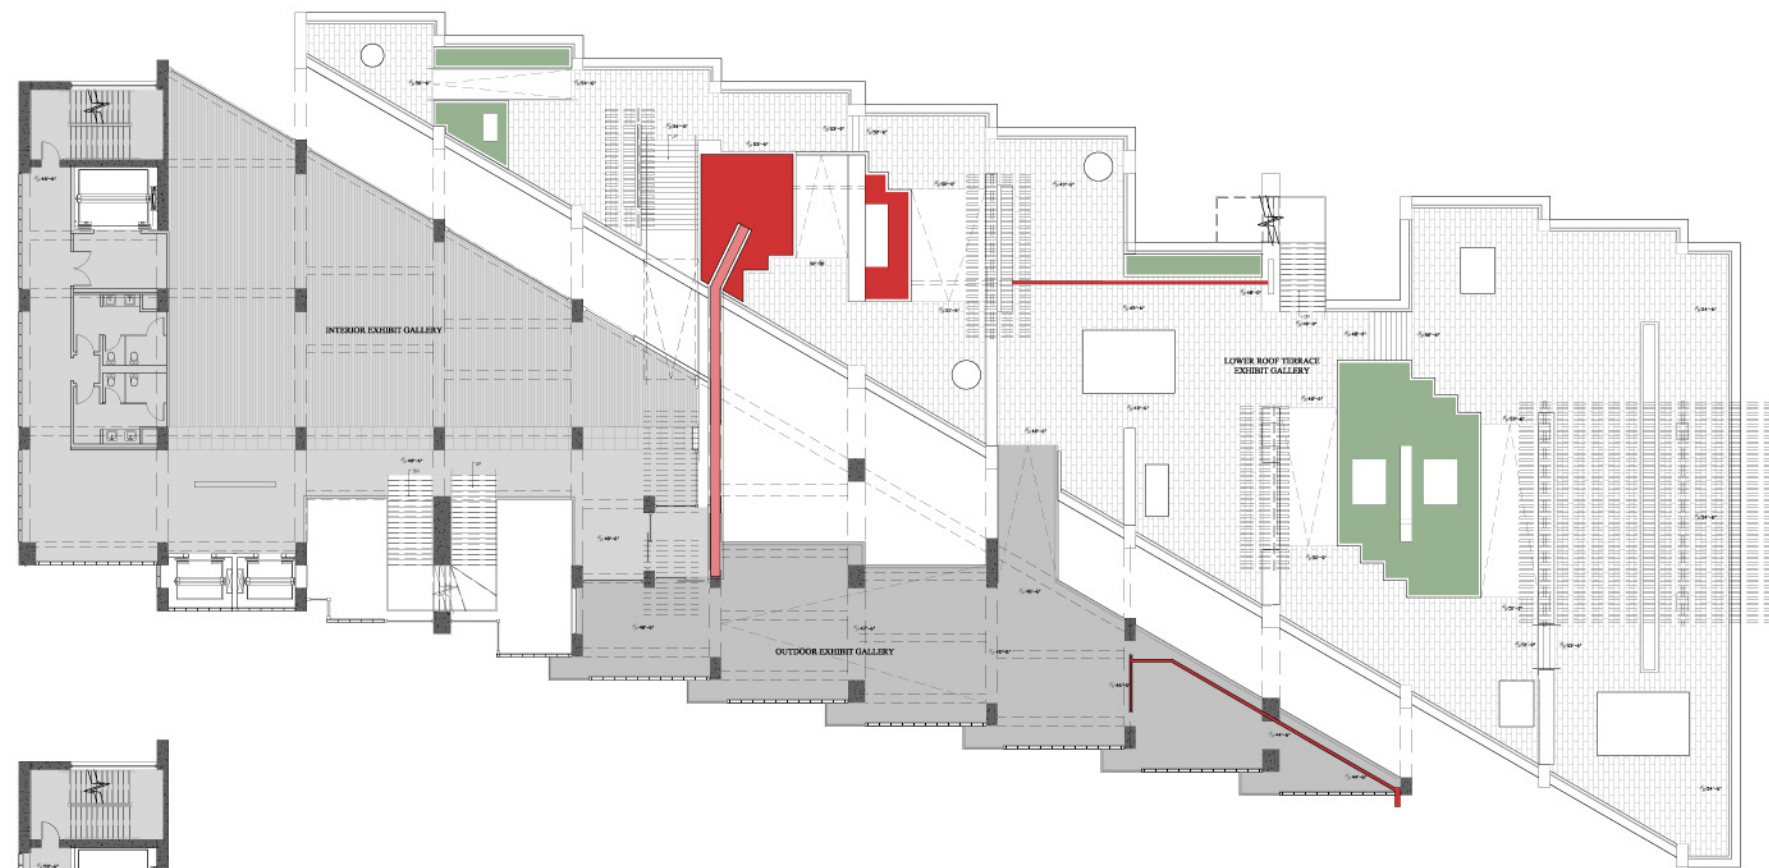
EXHIBIT HALL LEVEL AND LOWER ROOF TERRACE
